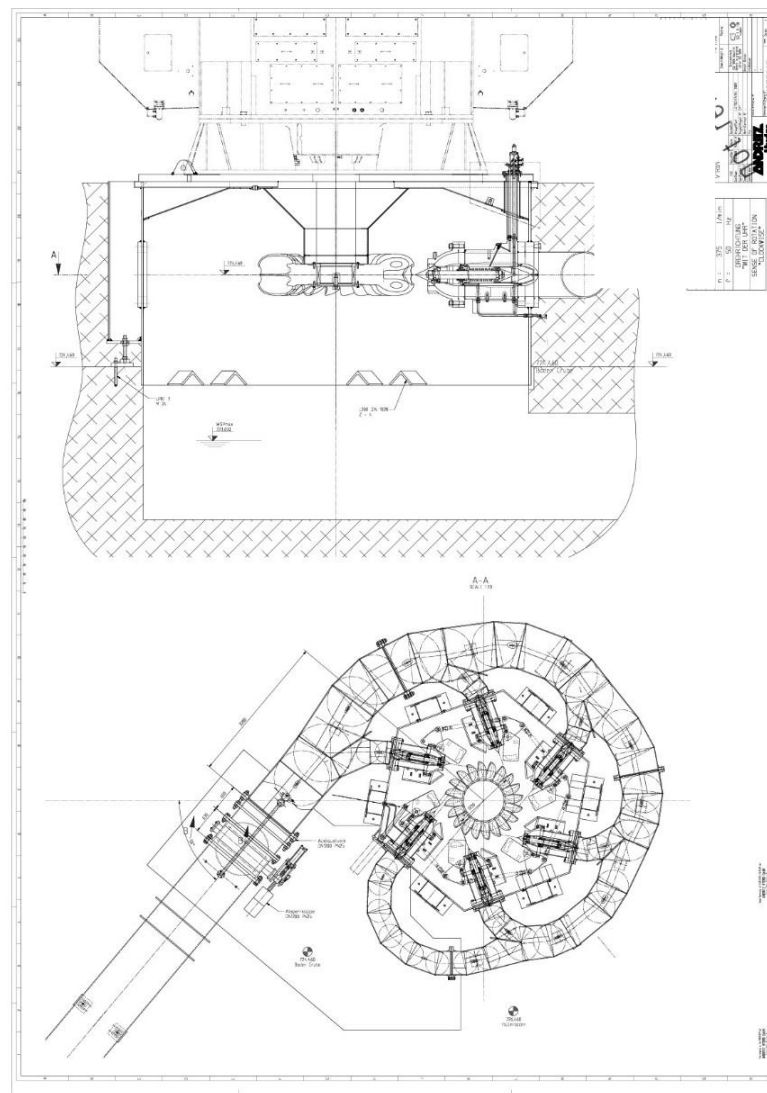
Detail of Pelton Runner and Jet Arrangement
